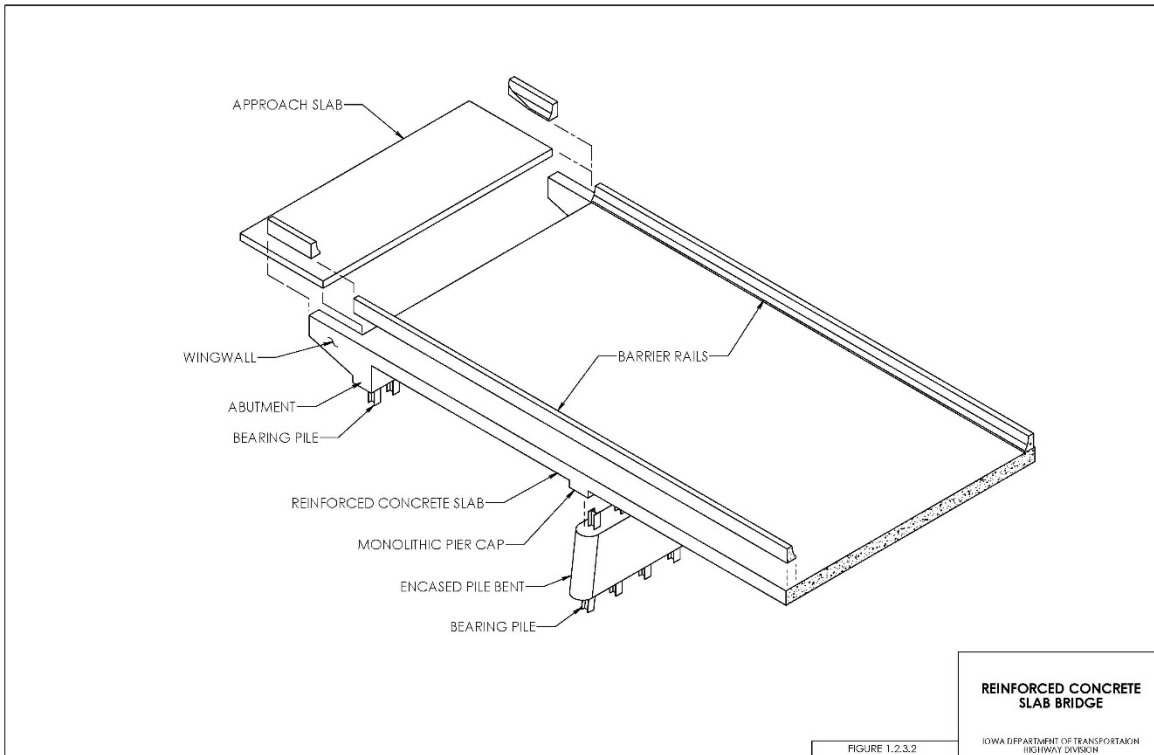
Reinforced Concrete Slab Bridge Components
